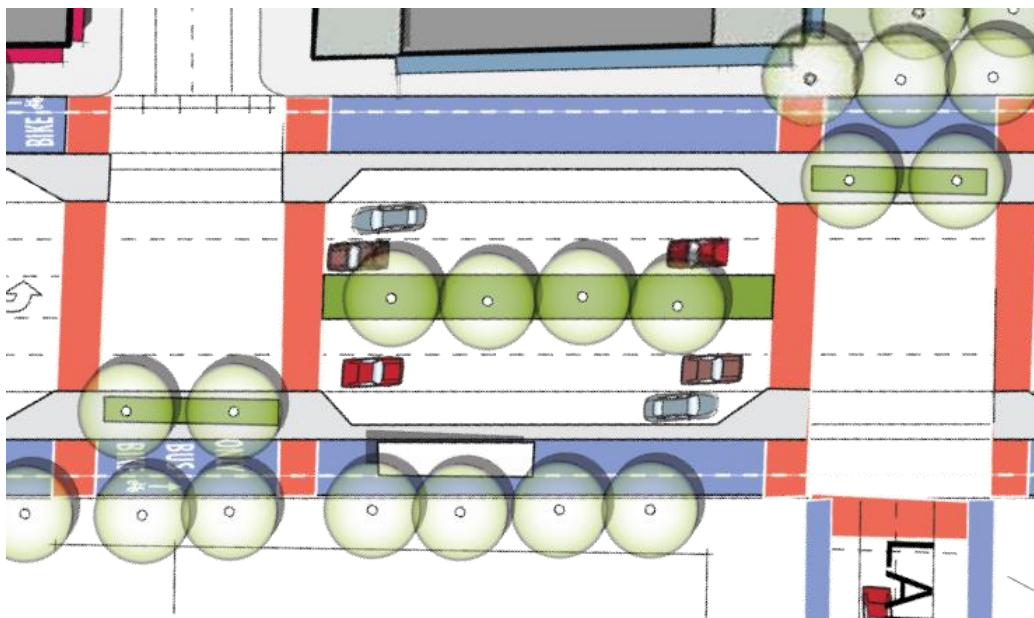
Proposed East Jefferson Avenue configuration - plan view
